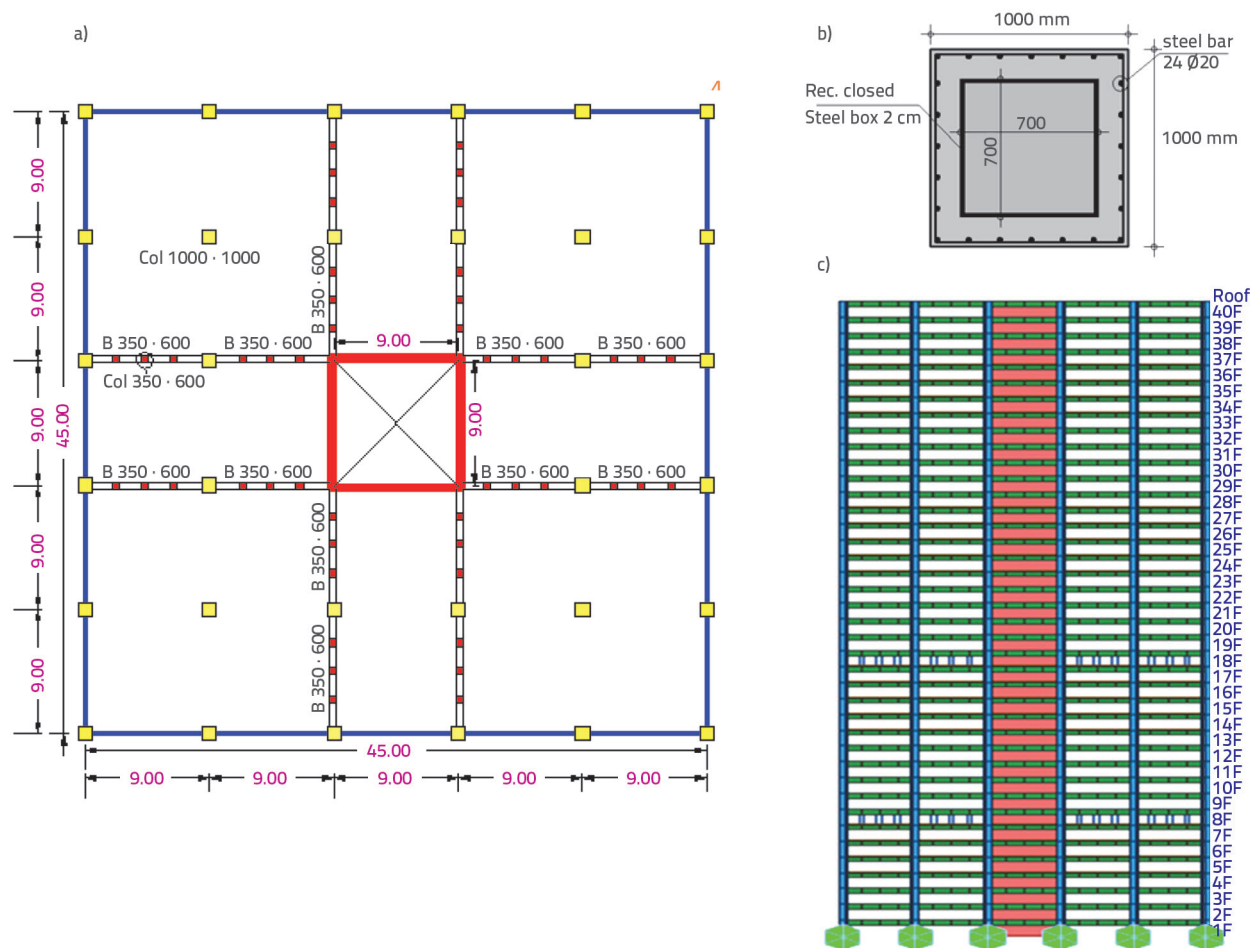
a) Viereendeel outrigger plan; b) composite column reinforcement detail; c) Elevation of model with outriggers at 8th and 18th stories
